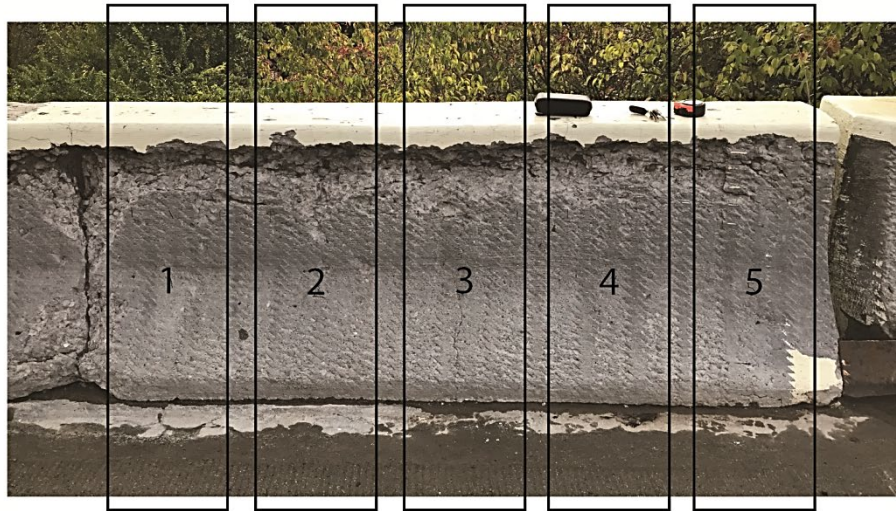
Moisture content of parapet wall sections for Gantz Rd. Bridge (11.02.17), Application No. 1
